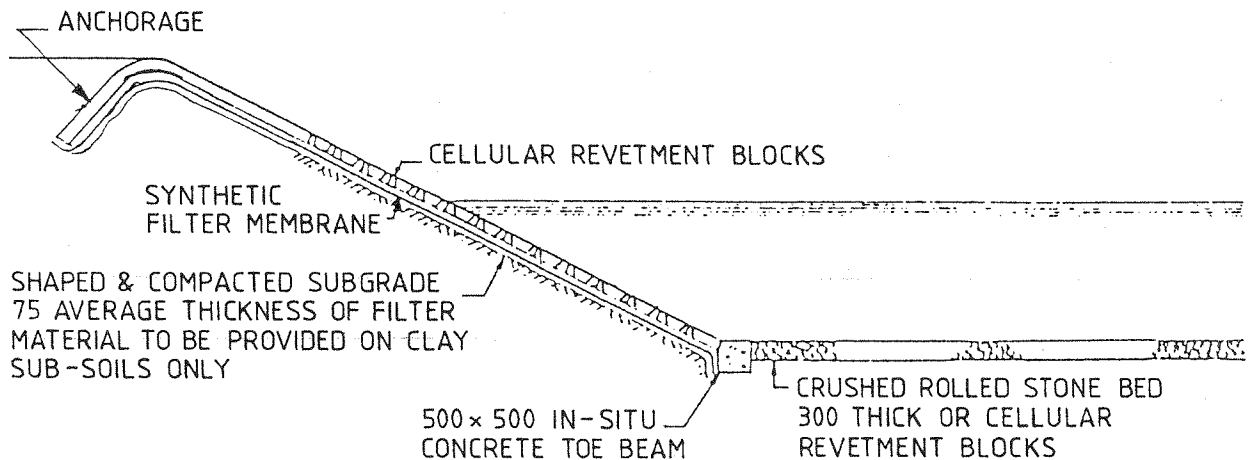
TYPICAL USE OF PRECAST CONCRETE CELLULAR BLOCKS
